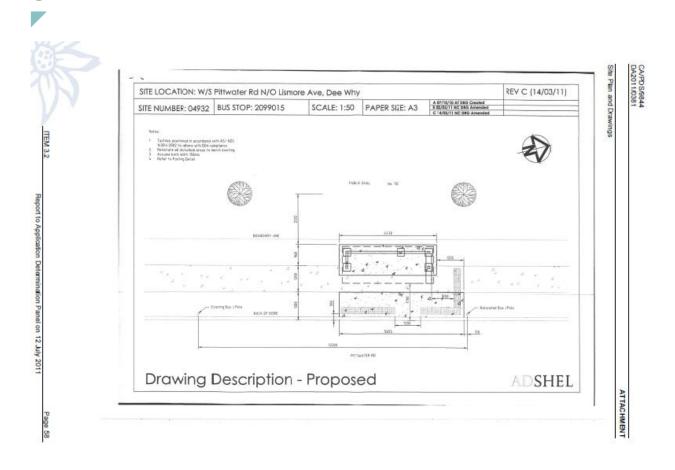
Shelter J2 DA2011/0381 Submitted Site Plan (Extracted from DA2011/0381 Assessment Report)
